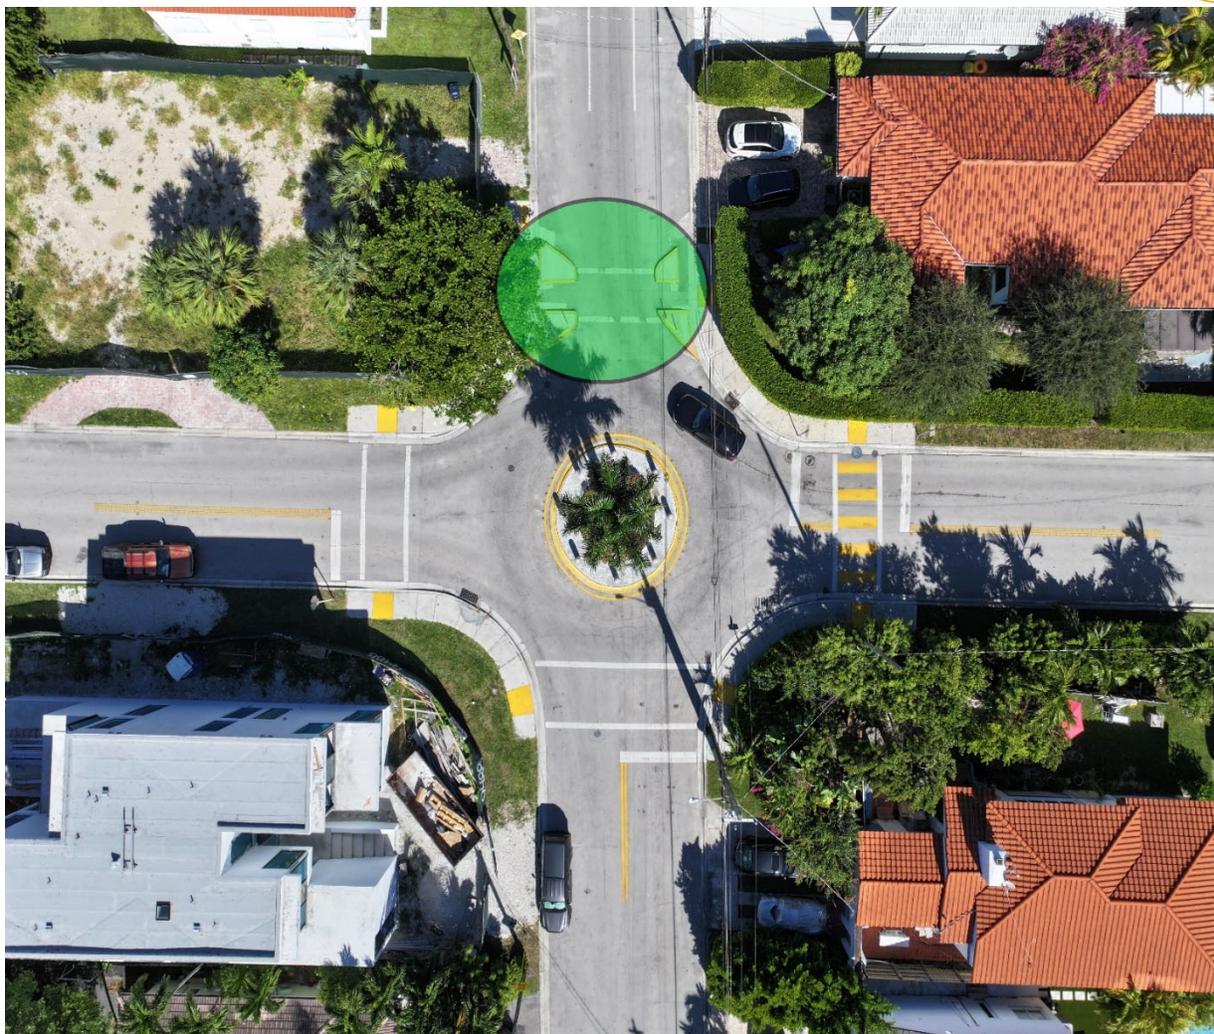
Bay Drive and 96<sup>th</sup> Street intersection
